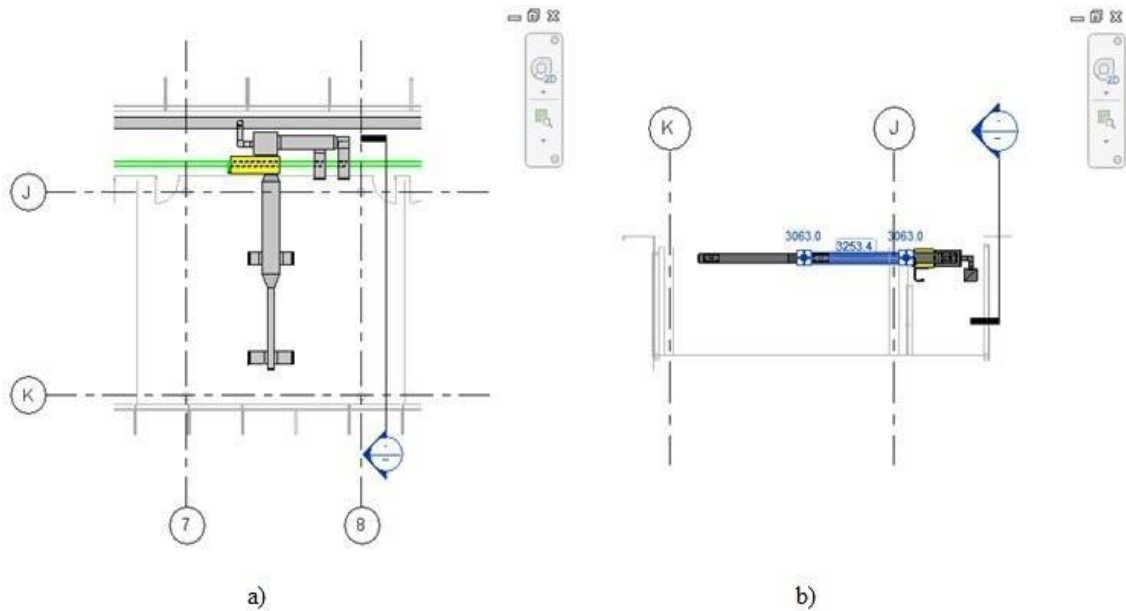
The floor plan of a room with a water source heat pump (a) and a cross-sectional plan (b).
